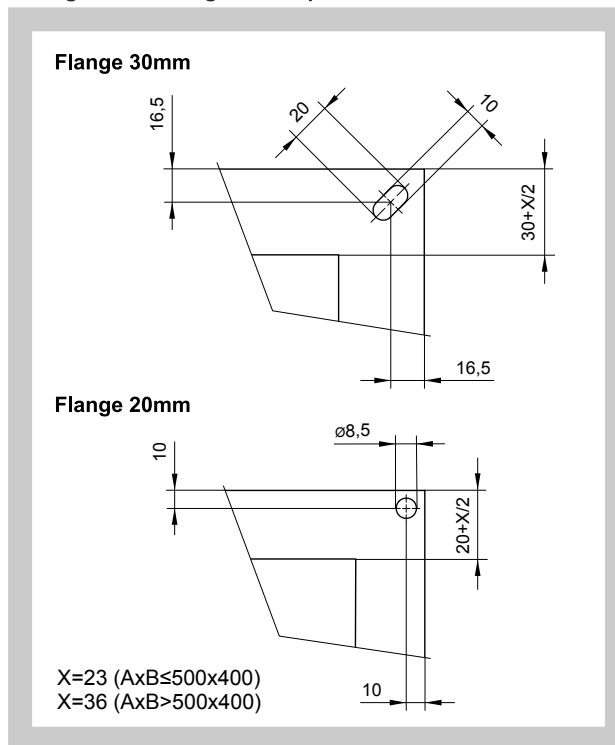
Flange of Damper - INSTALLATIONS SIDE
